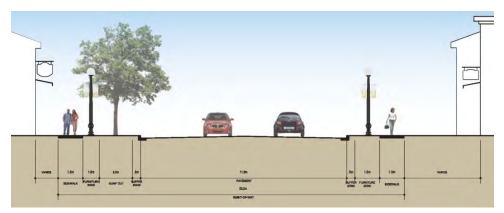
Alternative 2 - Providing bulbouts along Guelph Street provides the opportunity for on-street parking and the addition of street trees, seating, and pedestrian amenities.
